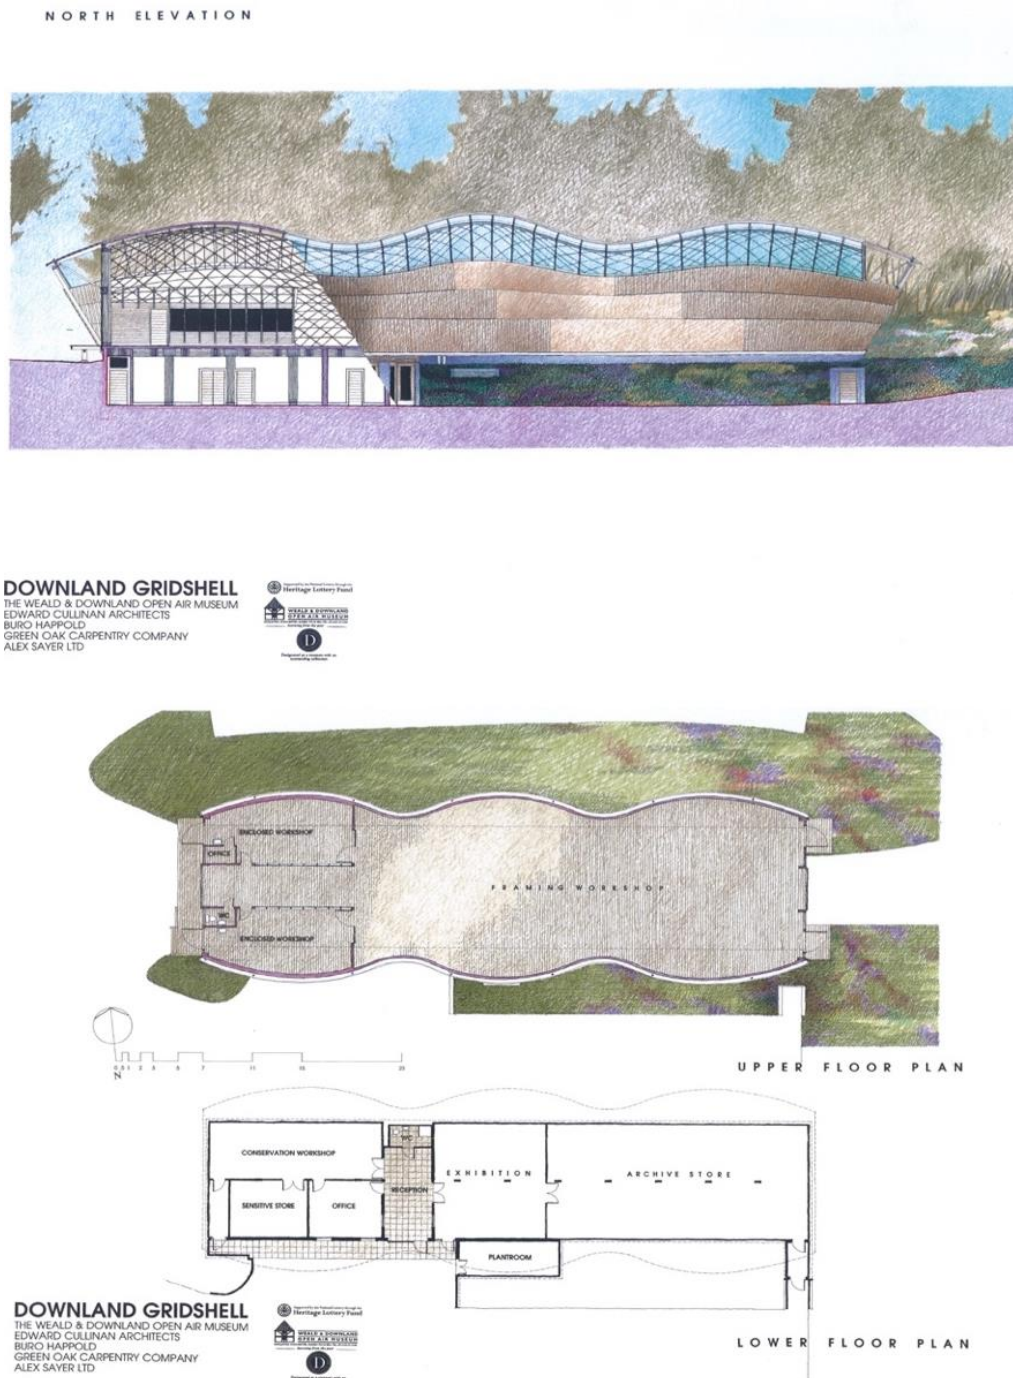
Plans, elevations and sections of the Weald and Downland Gridshell, 2002 by Studio Cullinan.
